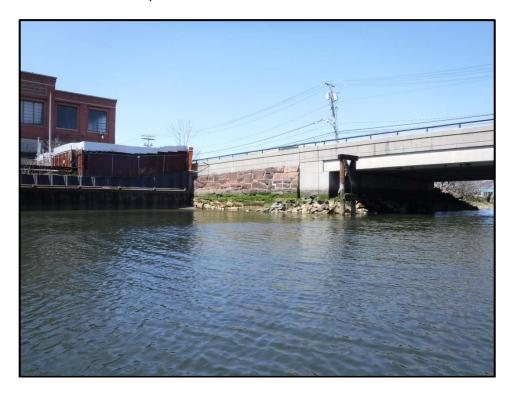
Grand Avenue stone masonry seawall, looking northwest, photo taken April 14, 2016.
